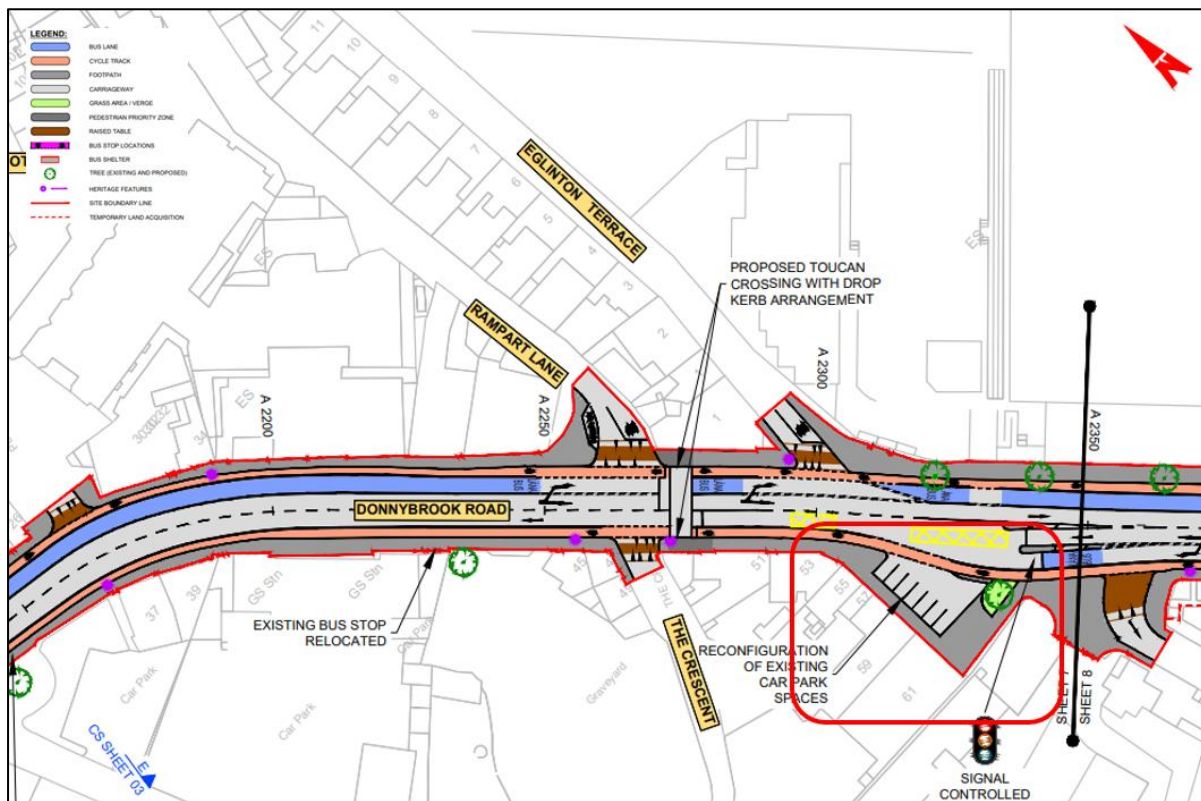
Extract from General Arrangement Drawing at No.55 to 61 Donnybrook Road (Sheet 07)
